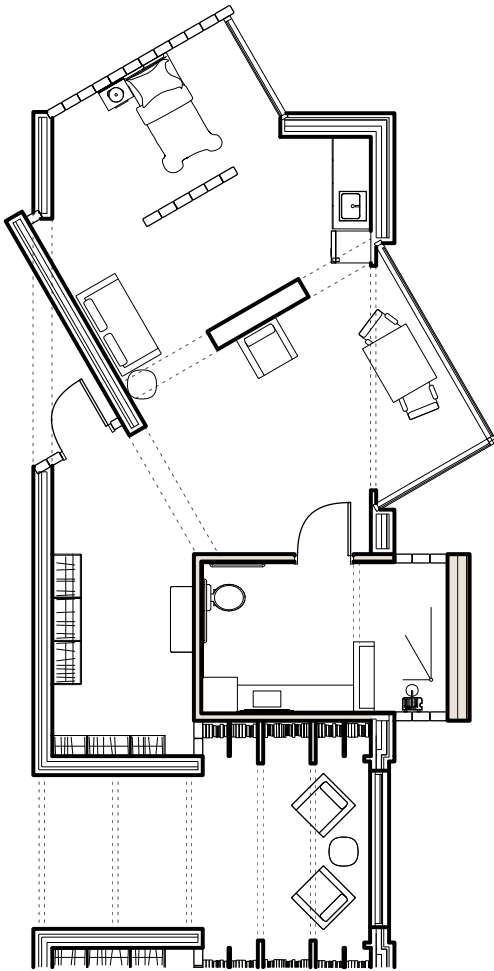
UNIT ONE FLOOR PLAN WITH WALL LAYERS
